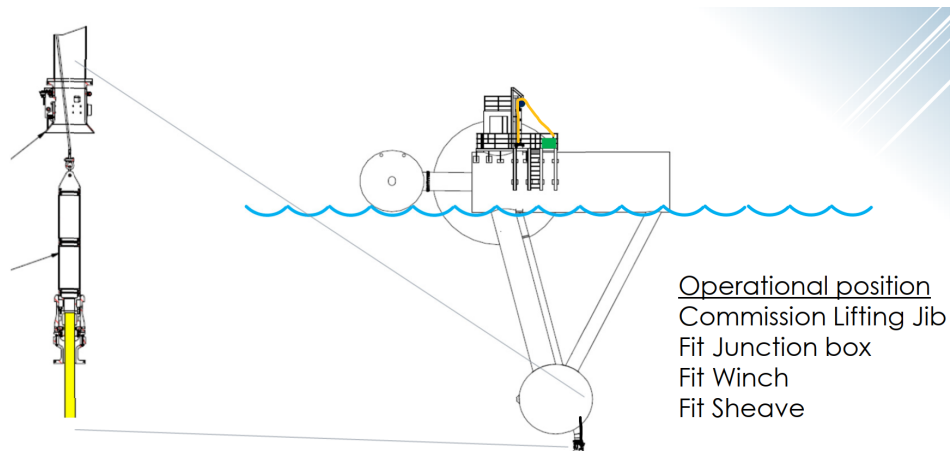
Umbilical cable pulled through I-tube using jib-crane and messenger line.
